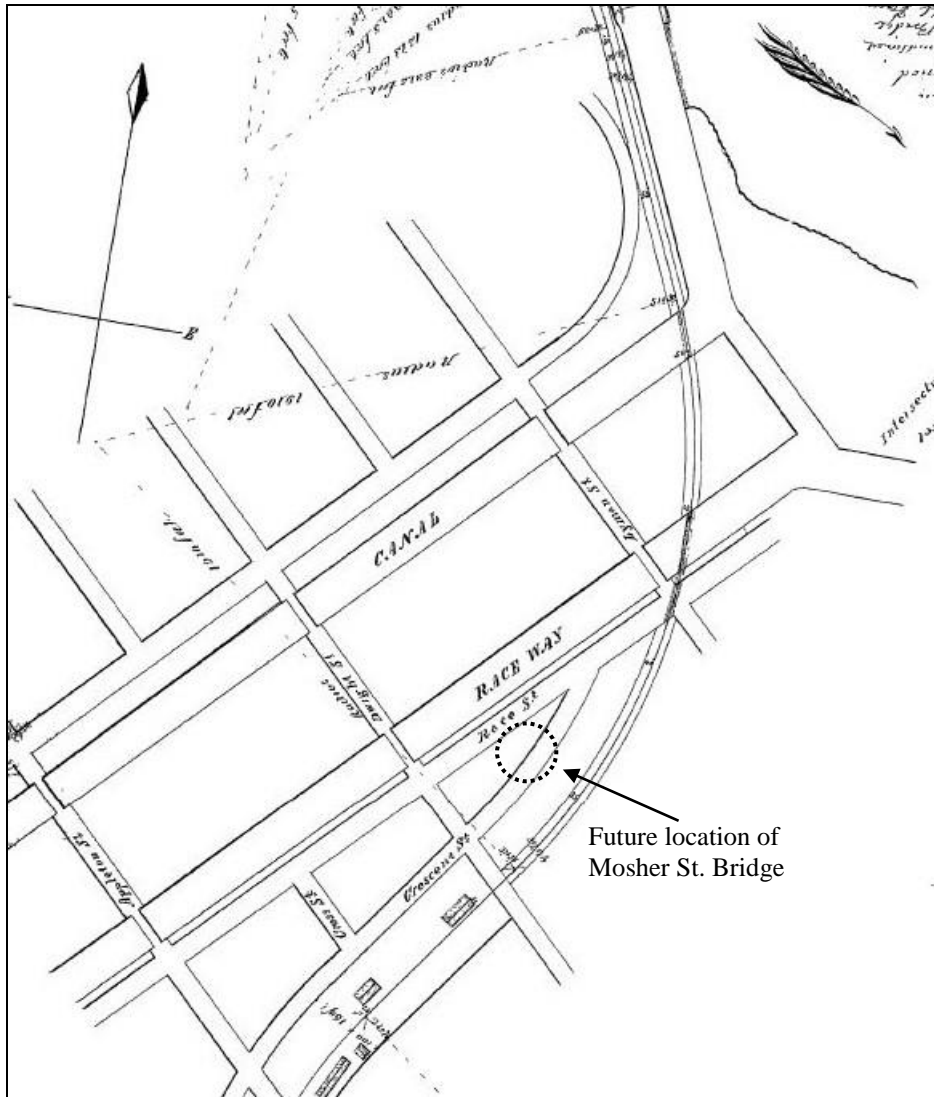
Plan Connecticut River Railroad in City of Holyoke, April 16, 1849, showing original track layout before elevation of line and building of new (1883) station. Note that Mosher Street is not present; Dwight Street crossing is at grade. (Source: Railroad Index Book, Hampton County Register of Deeds, Shelf 10, p. 1, April 16, 1849. Hampton County Railroad Project, digital record, pg. 787).
